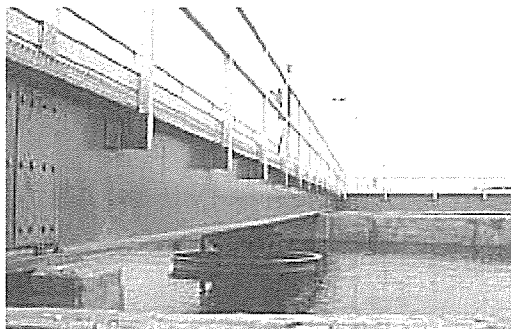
FRP I-girder bridge (photo: Strongwell)
